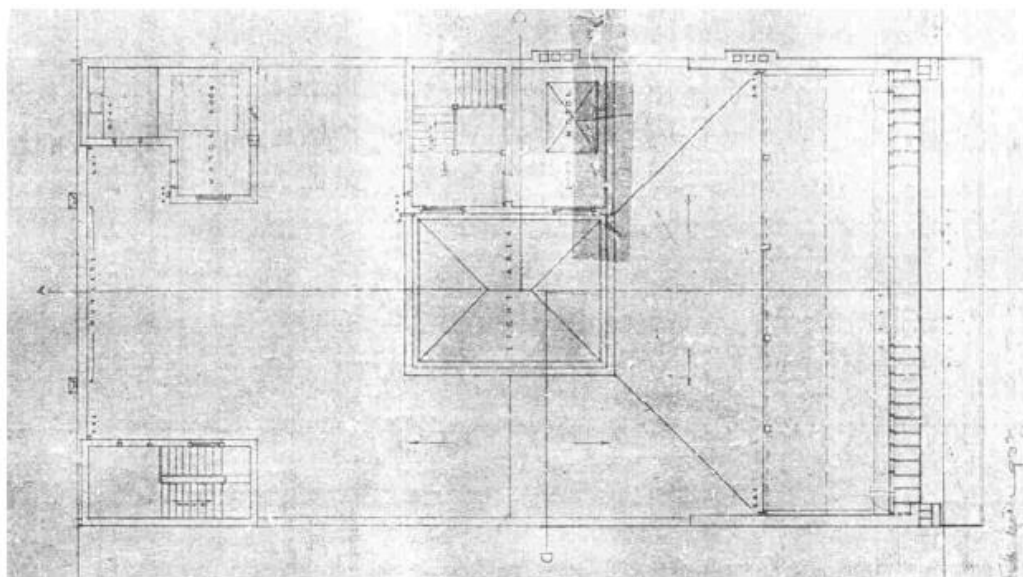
Plan of the roof floor by Wilson, Neave and Berry, 1922 (Source: City of Sydney Archives, BA 74/22)
